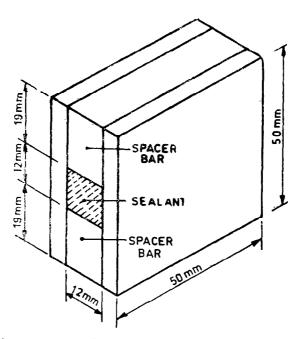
ASSEMBLY FOR TESTING ADDESION AND CODESION IN TENSION
